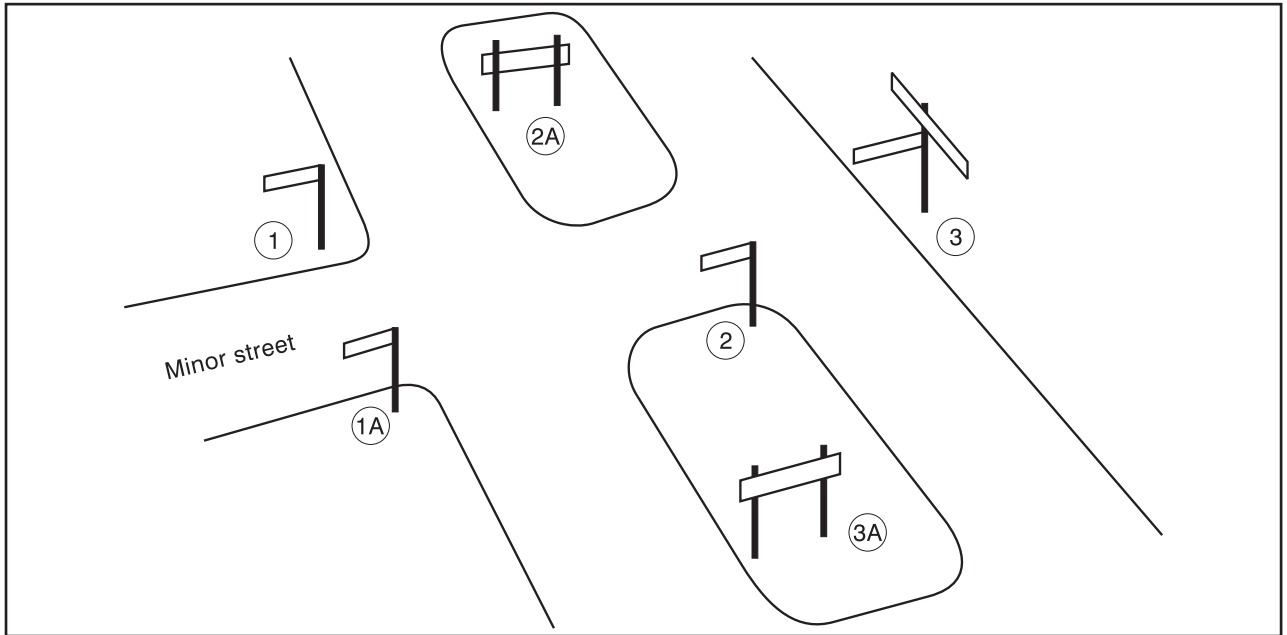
DIVIDED MAJOR STREET T-JUNCTION WITH MEDIAN OPENING
